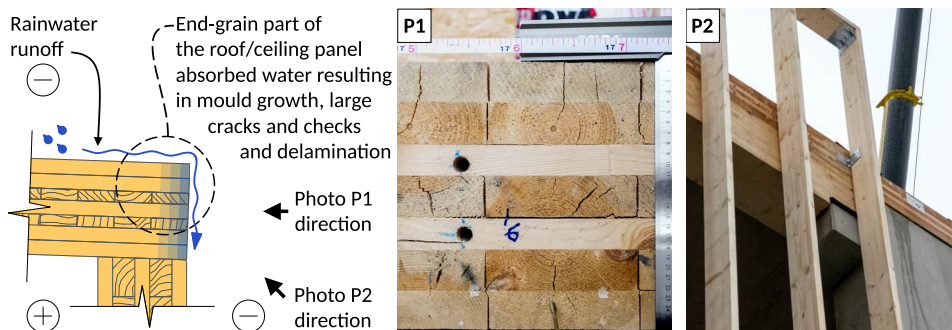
CLT roof panel connection, where large cracks (P1), delamination, and mould growth occurred after frequent wetting (P2) and moisture dry-out. Photos of the building A
